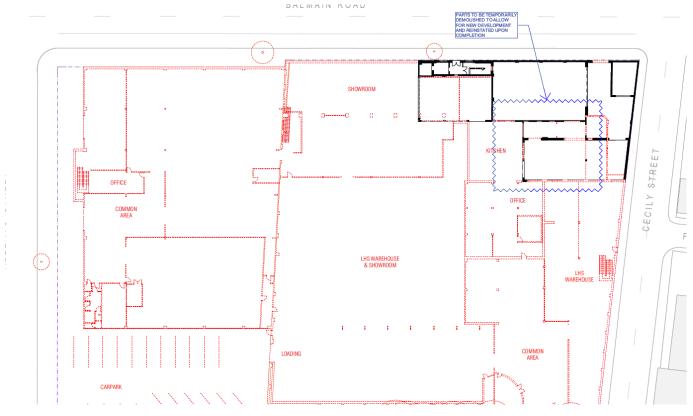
Ground floor demolition and retention plan (areas in red to be demolished/areas in black to be retained)
